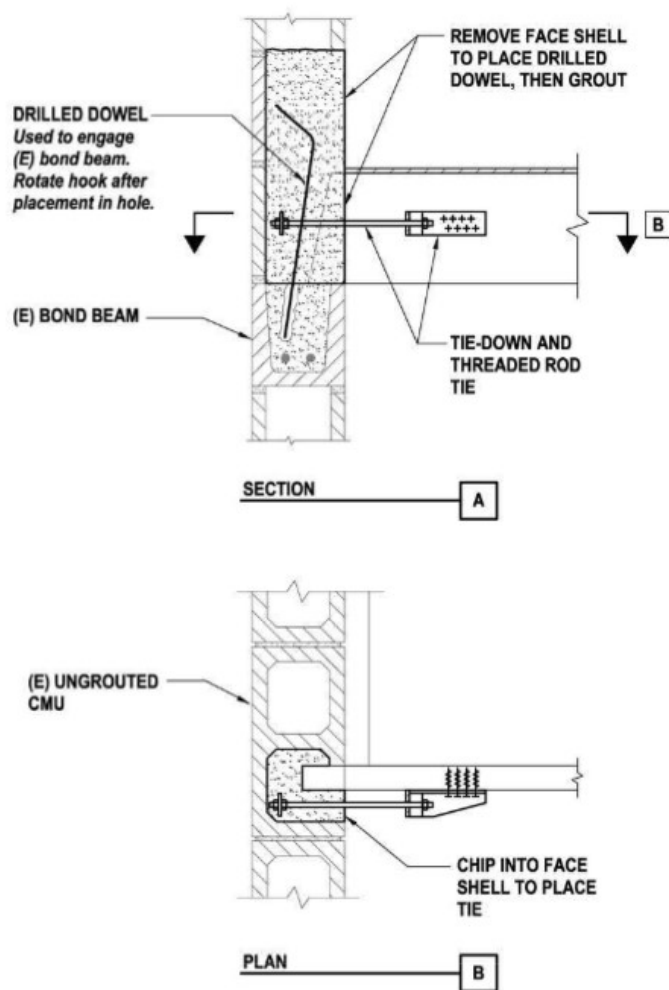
Wall-to-Floor Tension Tie in Hollow Masonry
